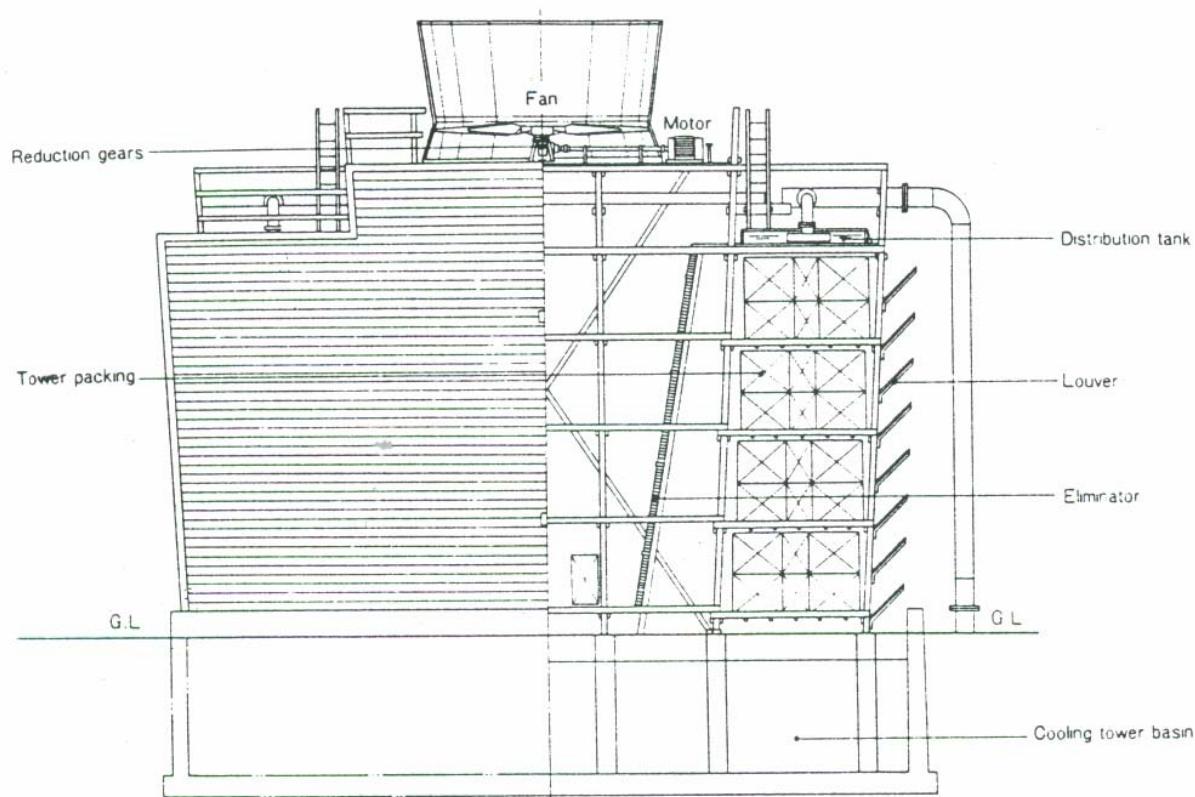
Cooling tower in a large size cooling system (induced draft cross flow type)
